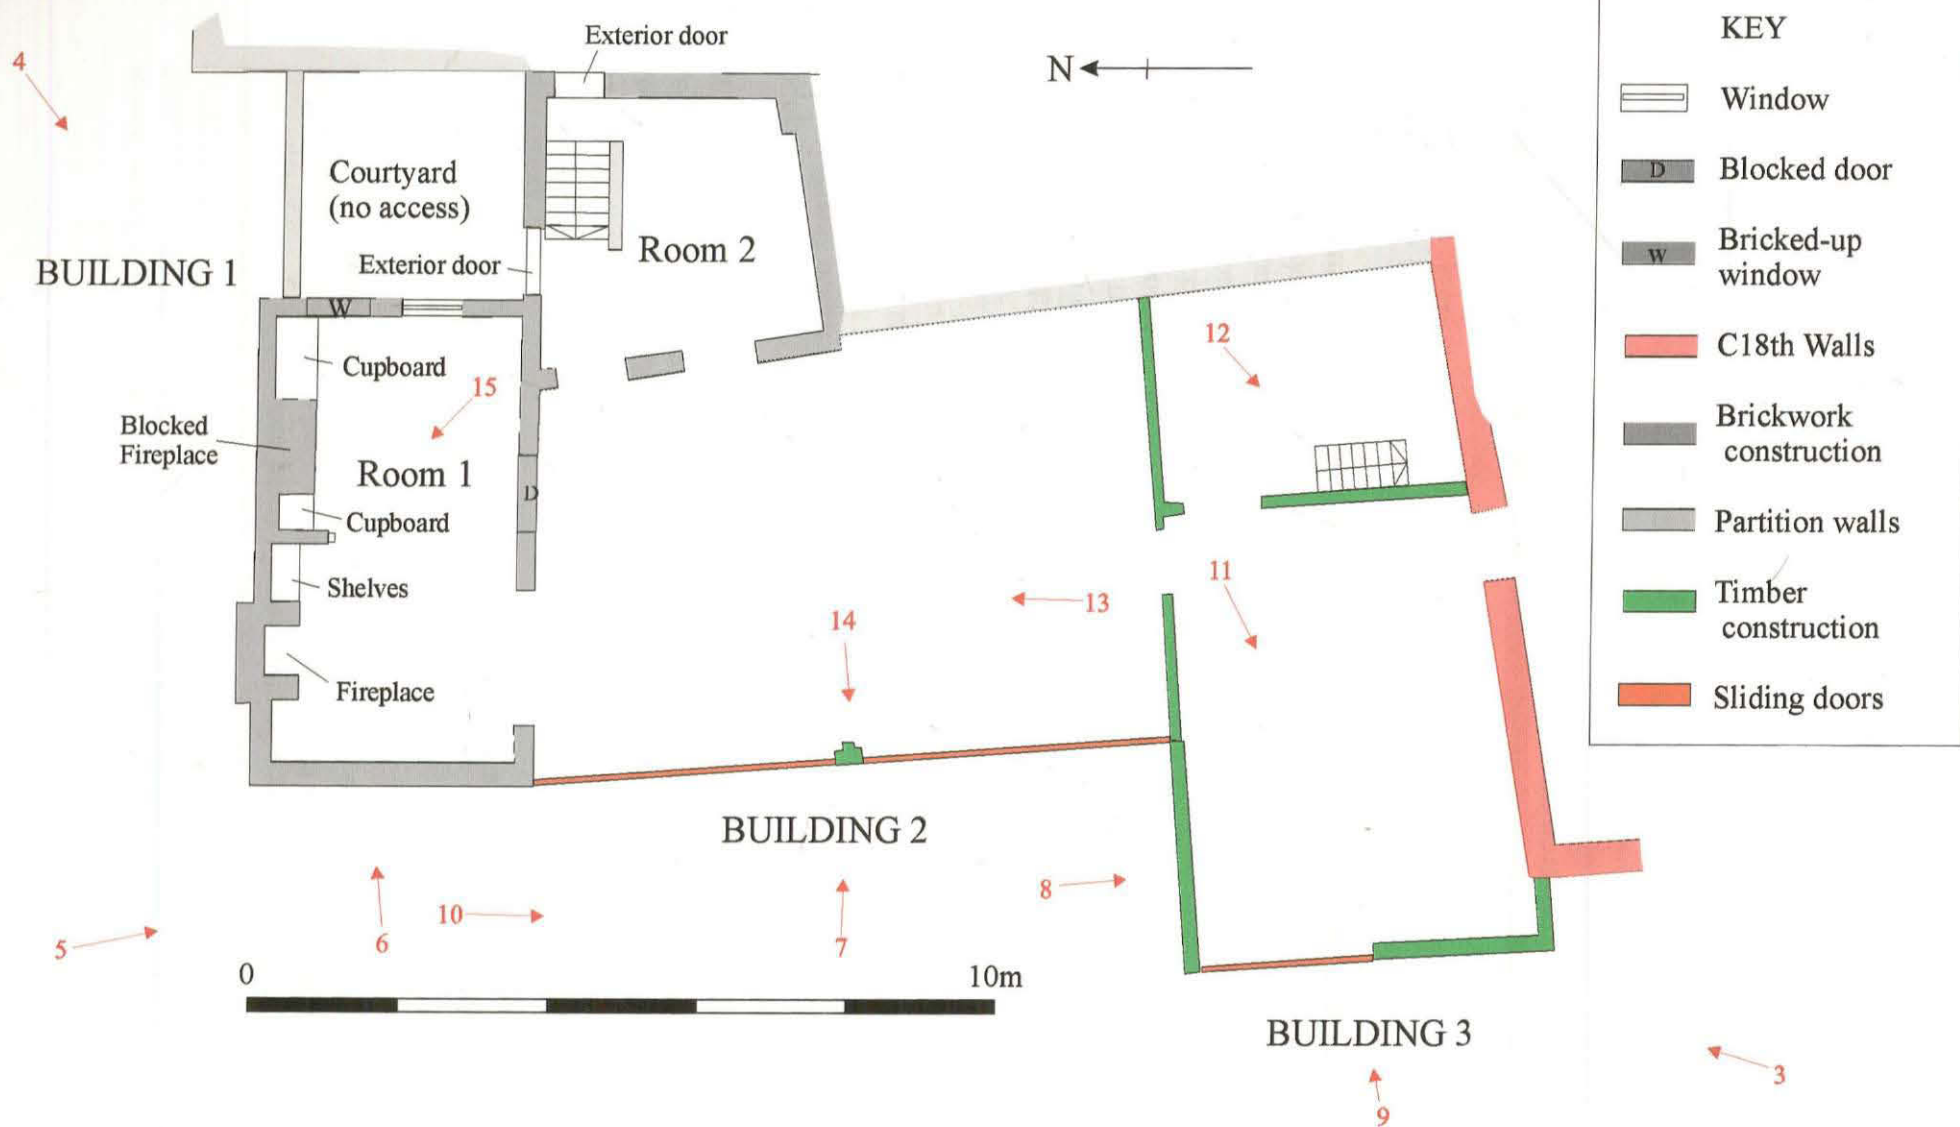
Plan of the ground floor level of Buildings 1-3. Scale 1:100. Approximate positions and directions of illustrated plates are shown as numbered arrows in red.
